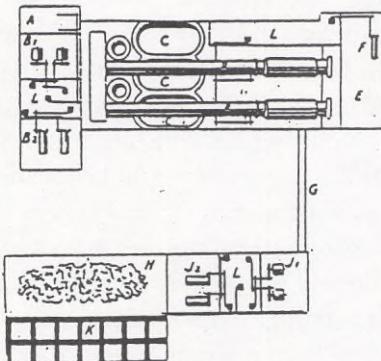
Group electric drive (excl. power station). A= Initial crushing; B= Tube grinders; C= Slurry basin; D= Rotary kilns; E= Hardcoal storage; F= Hardcoal grinders clinker silos; F= Cement grinders; G= Clinker transport; H= Clinker hall; J= Cement grinders; K= Cement silos; L= Motor rooms; ■= Electromotor.
